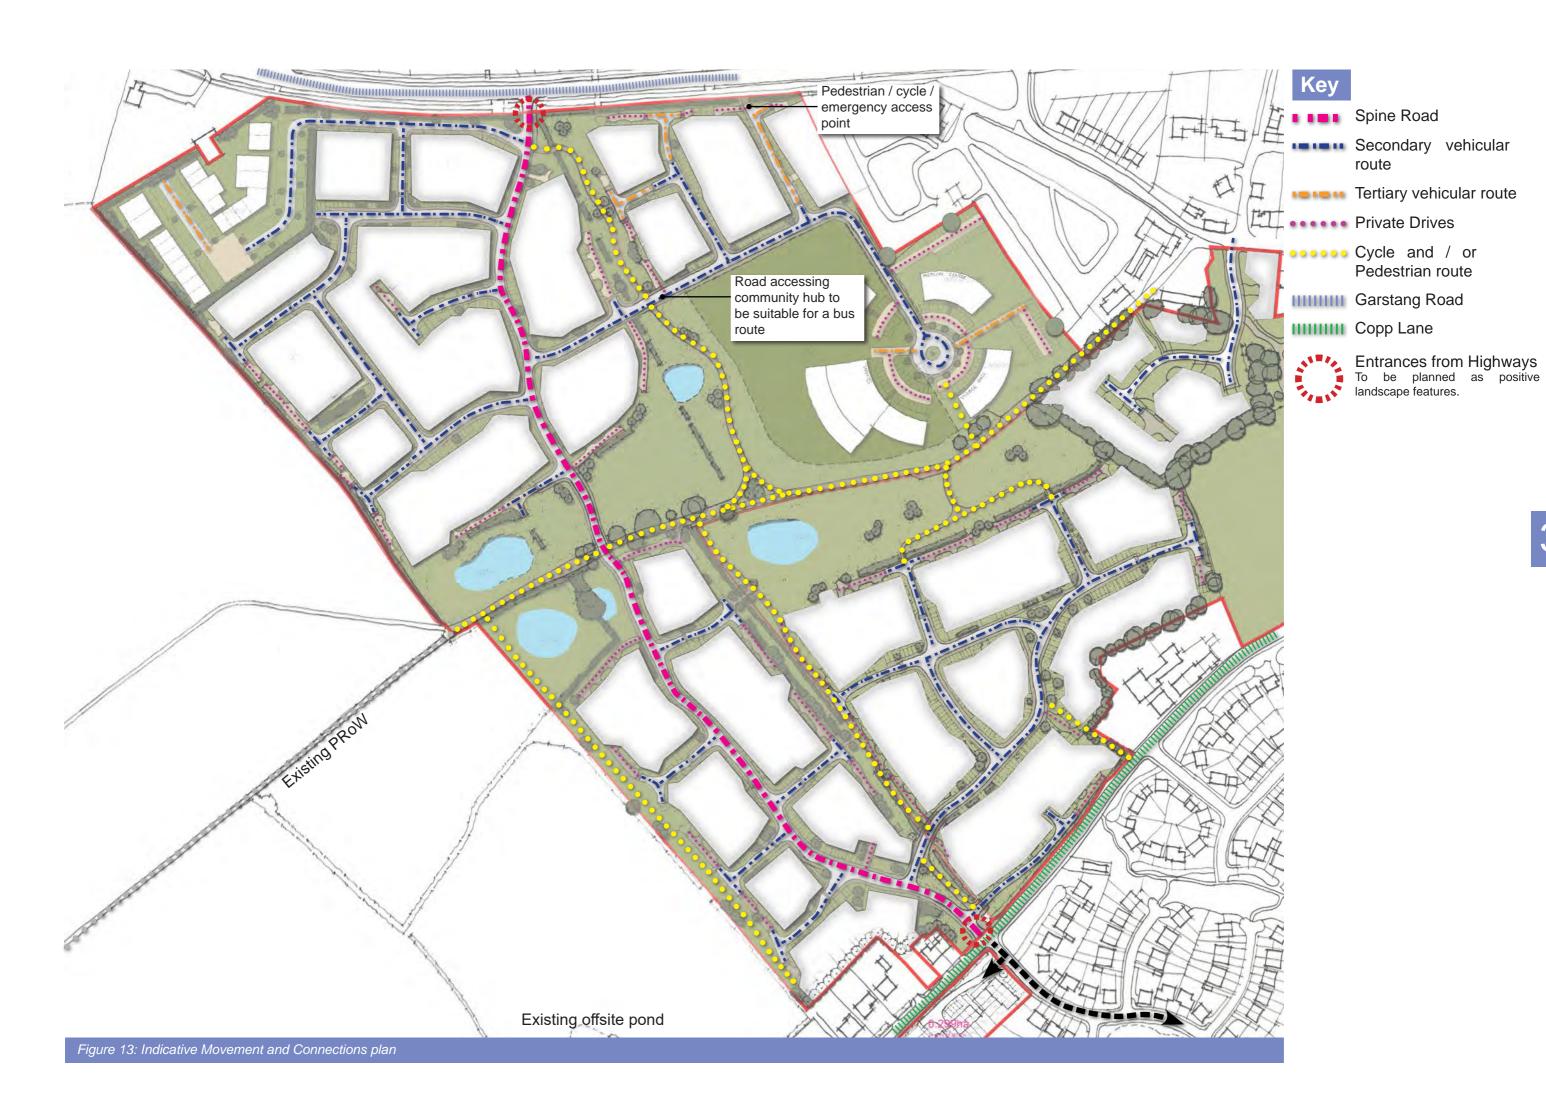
is an illustrative plan and the internal road layout is a matter for determination at the relevant planning application stage.
